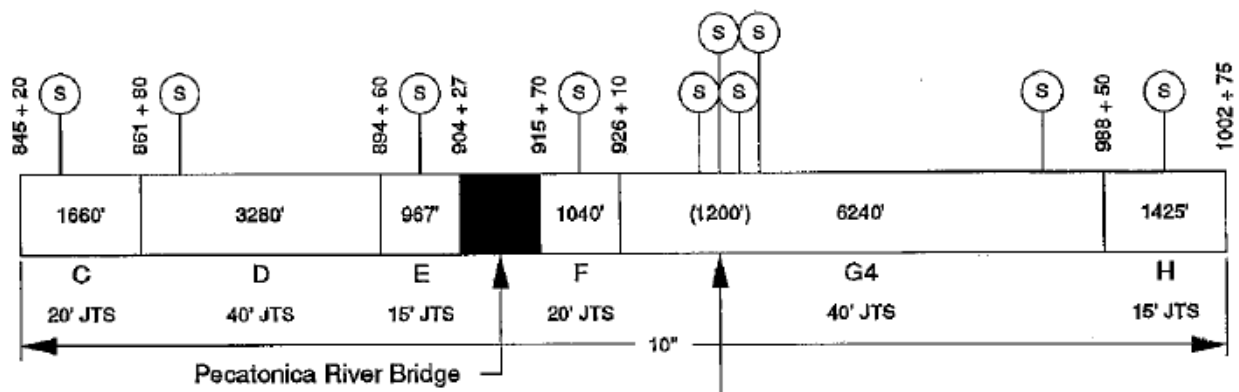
Site Layout for Test Section on US-20 near Freeport, Illinois (Reed and Schutzbach, 1993).
